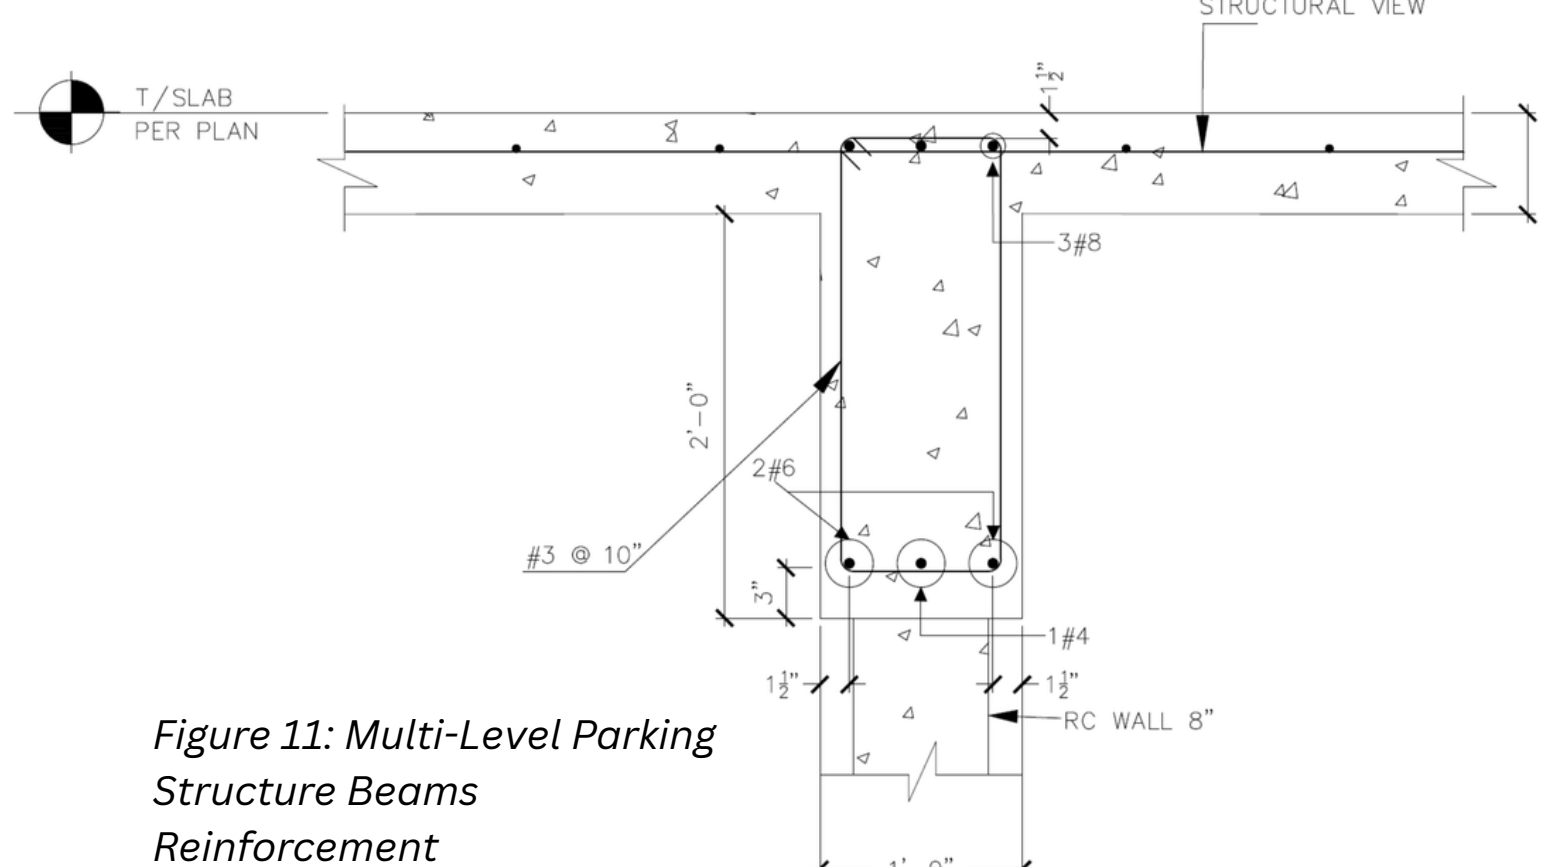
Multi-Level Parking Structure Beams Reinforcement
